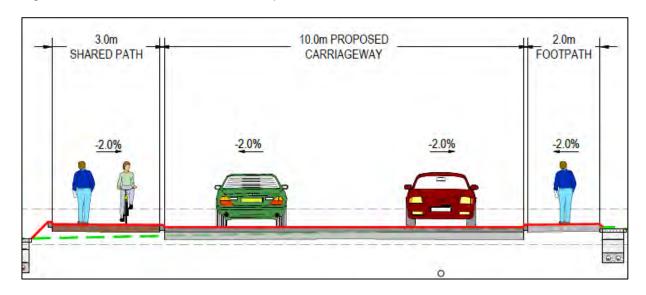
Zone A - Cross Sections of Proposed Access Road.
